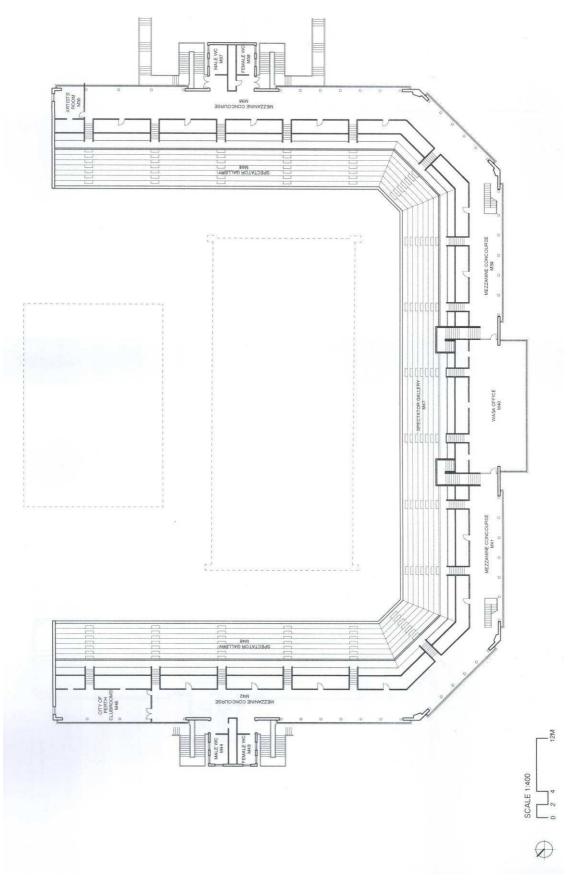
Beatty Park Leisure Centre – Mezzanine Floor Plan.
